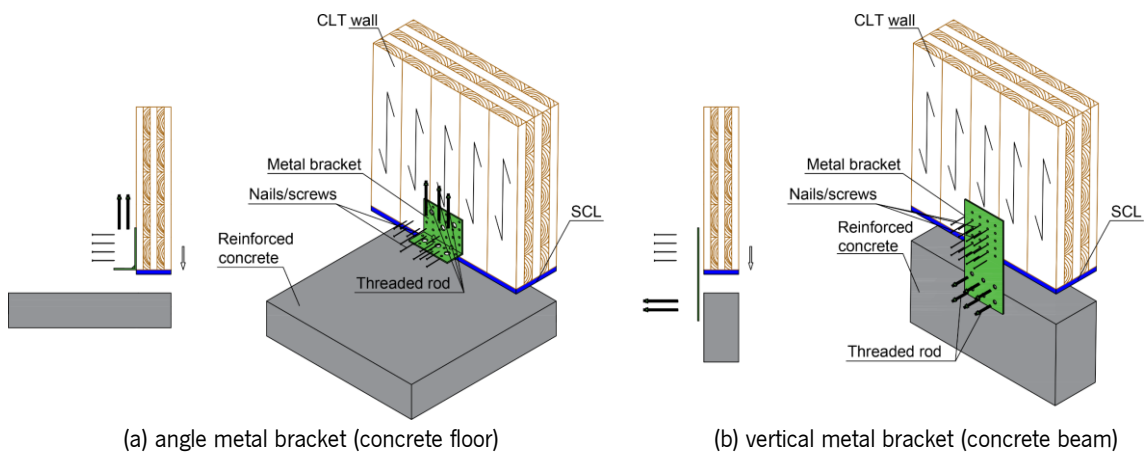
Typical connections of the concrete-CLT wall [2].
